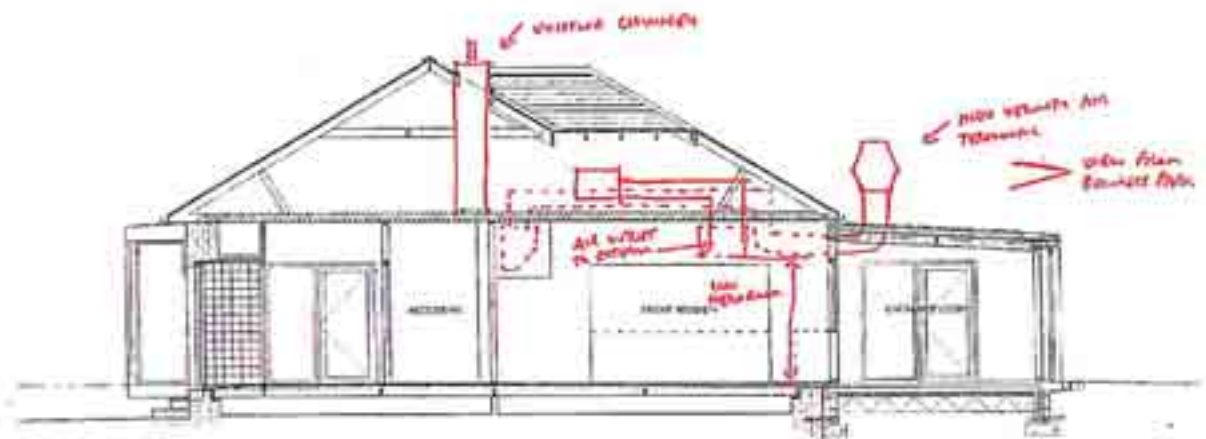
Example of cafe where air inlet and air terminal are exposed above roof. Note that although a flat roof has been installed to help conceal these elements, they are still visible.
